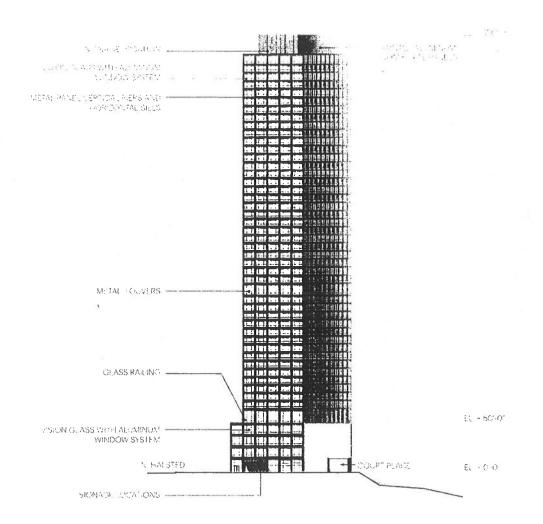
E: COURTYARD NORTH ELEVATION
